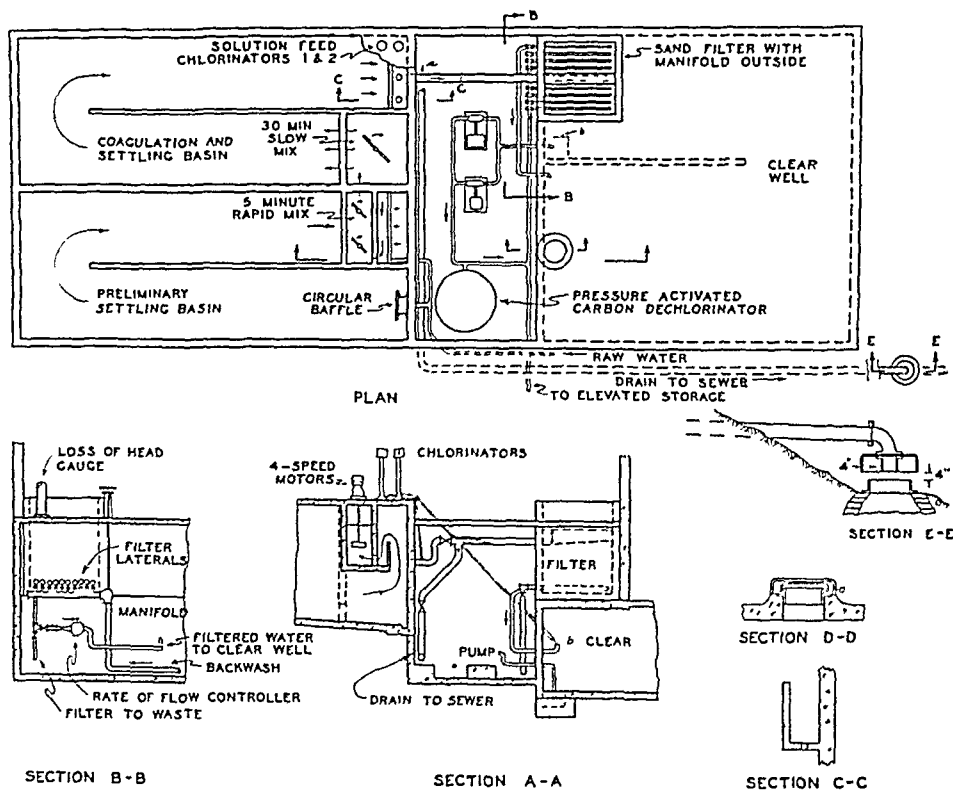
Figure I is a schematic drawing illustrating the main features of this, an early plant. The plant is built behind a power dam but the fall was not sufficient to avoid low lift. It has duplicate raw water and pure water pumps and duplicate chlorinators. For mixing of the chemicals there are provided 4, 10 min. mixing basins so arranged as to make it possible to effect 20, 30, or 40 min. mixing as desired. The stirring devices operate from one shaft connected to a speed reducer and a 4 speed motor (600, 900, 1,200 and 1,800 r.p.m.). The peripheral speed of the
